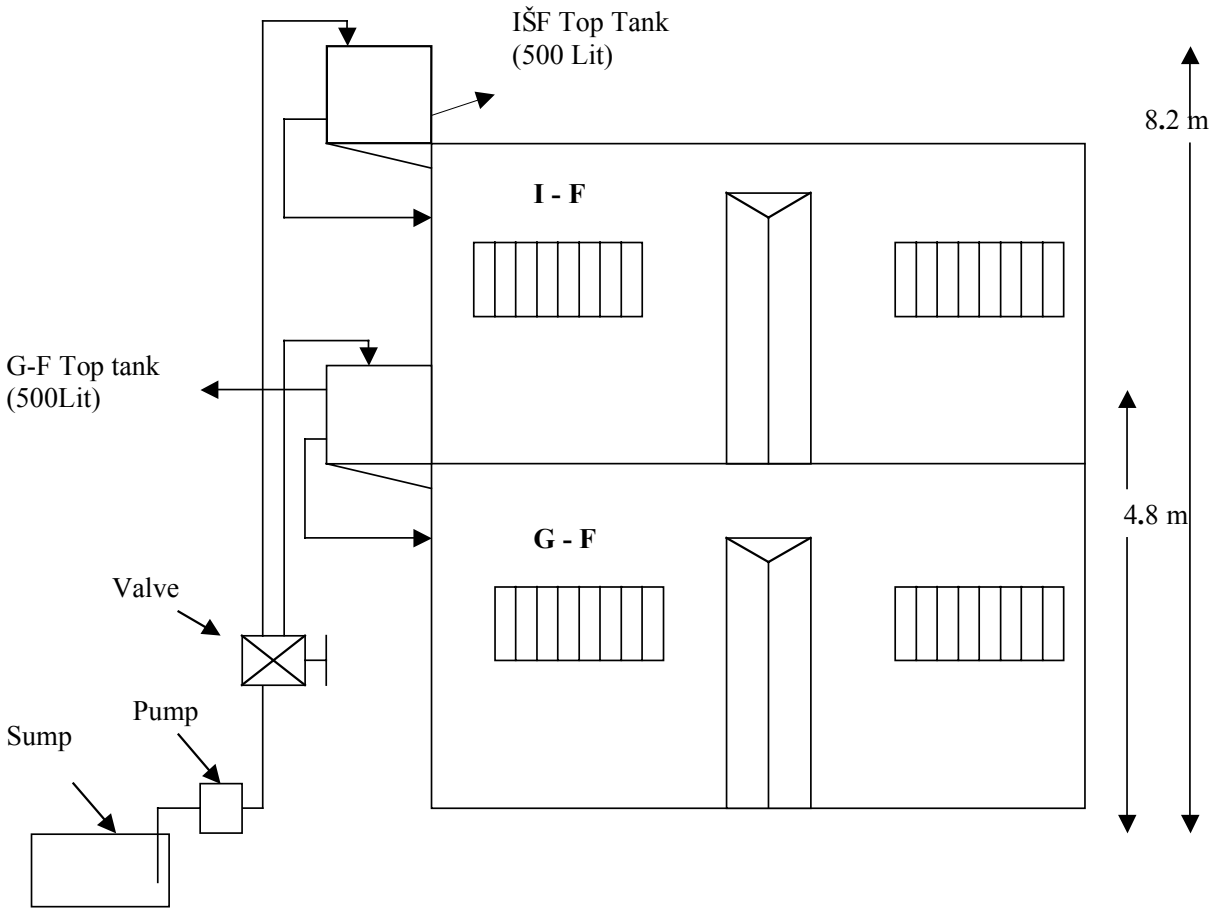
Proposed Scheme (IFSM) for 2 storied building
